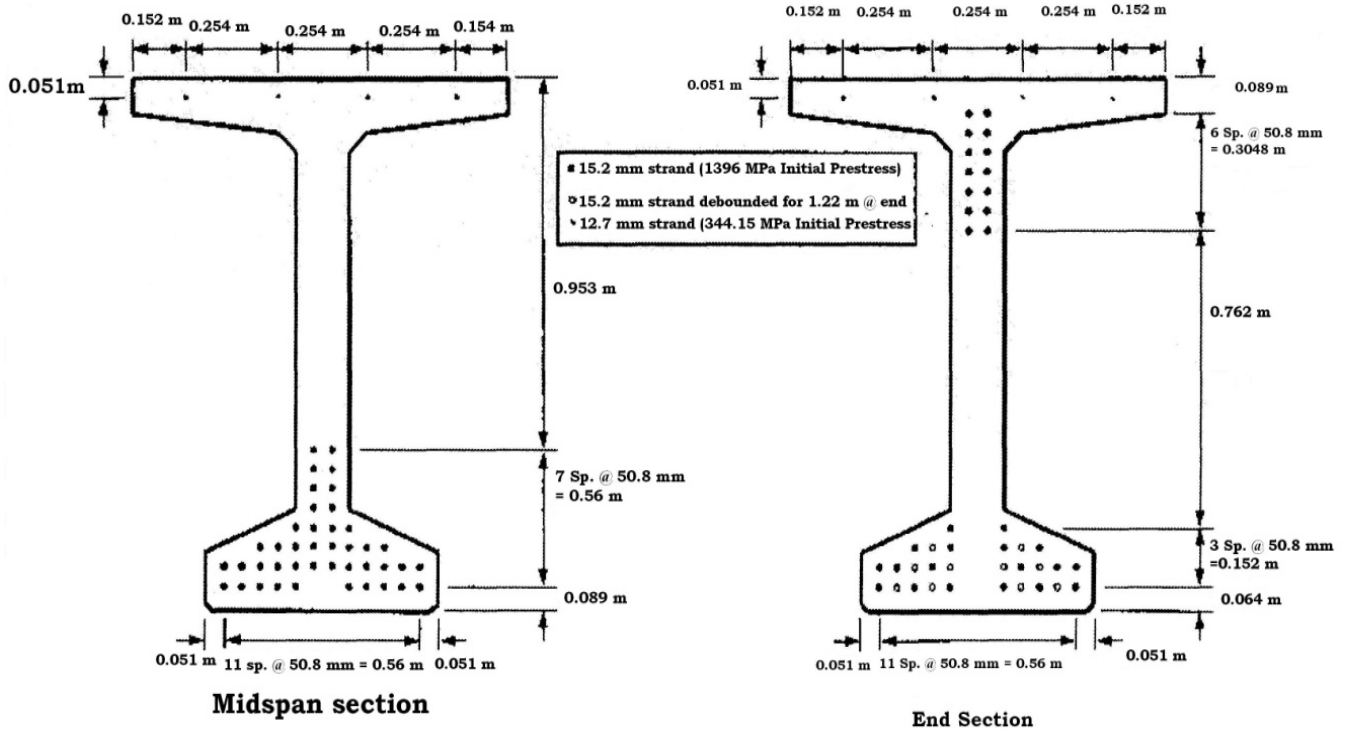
Midspan and end cross sections of HPPC girder showing the strands.
